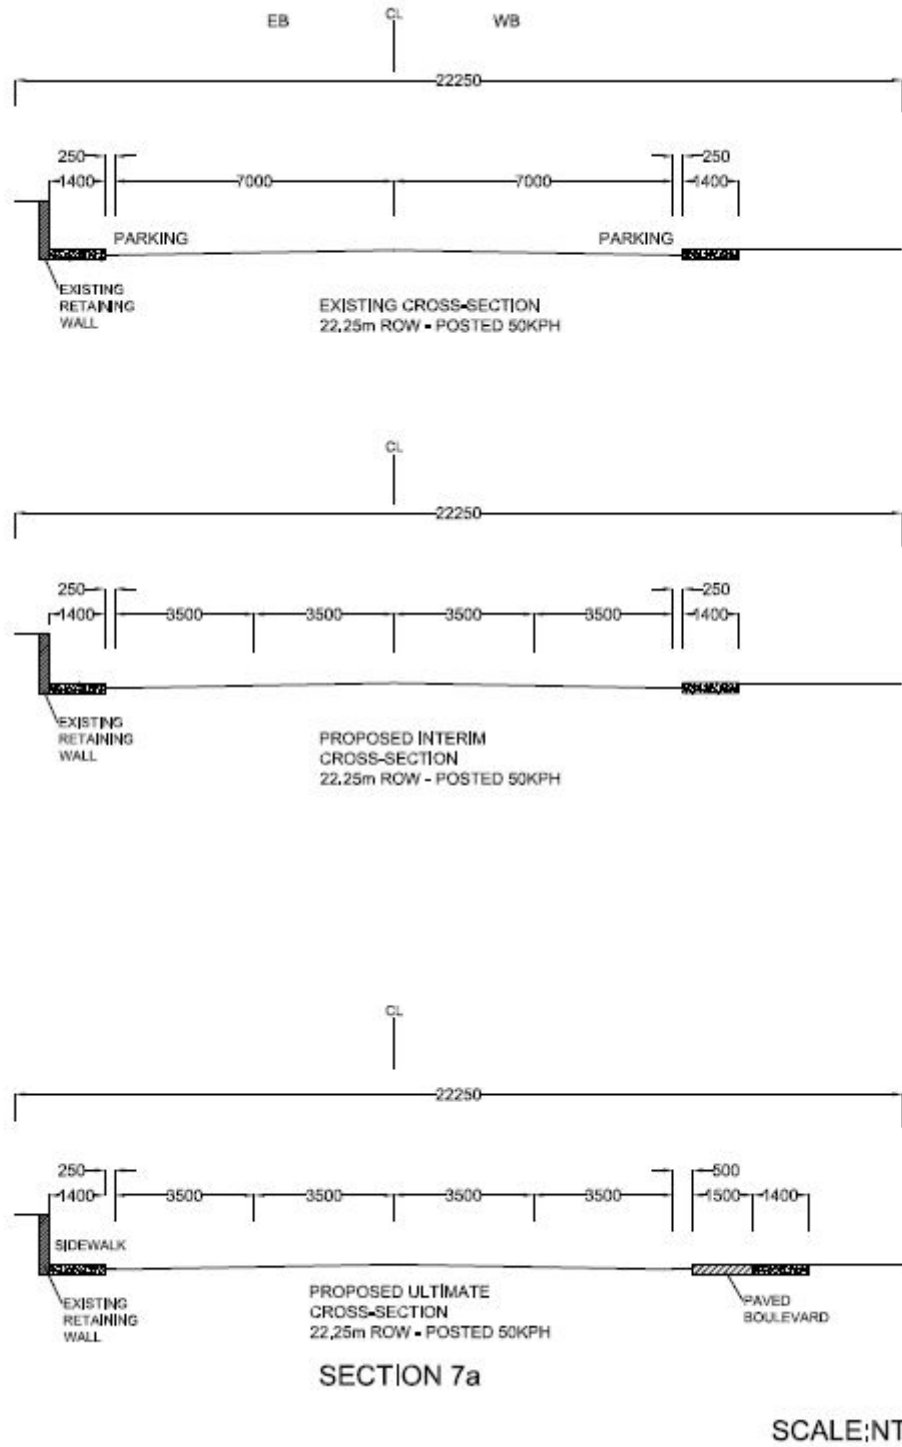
Proposed Section 7a - Hwy 22 West of 1st Street West
